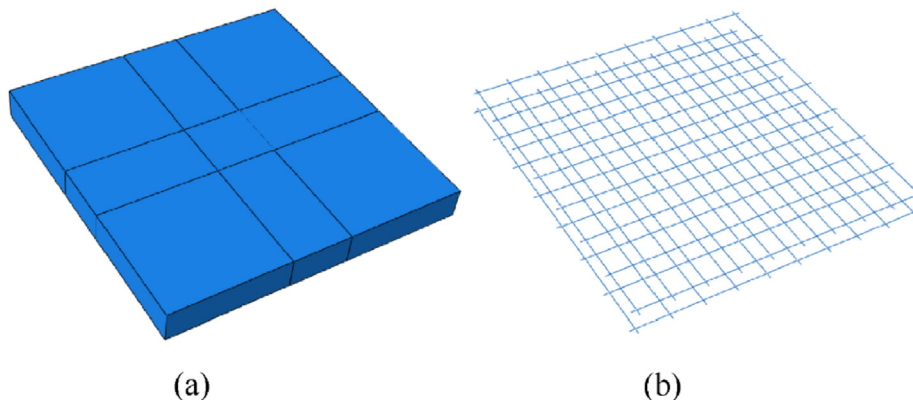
(a) Concrete slab and (b) steel reinforcement in RC panel.
